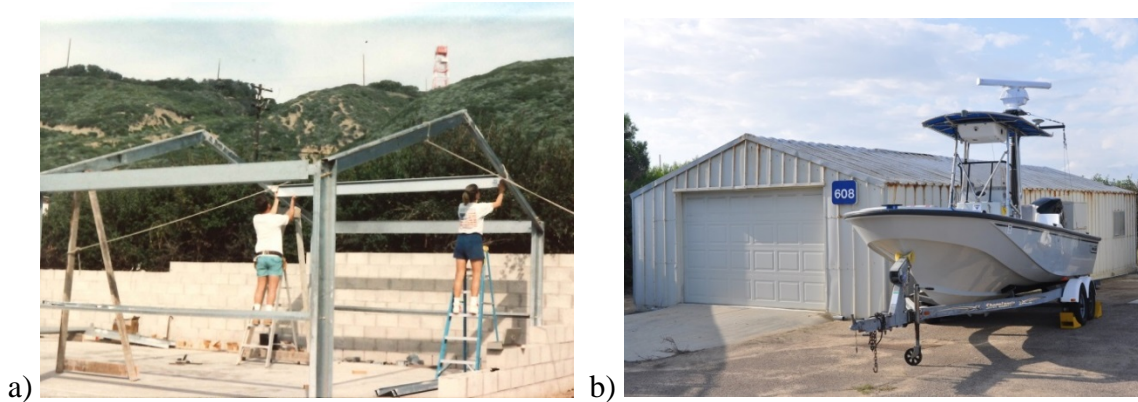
a) Bart Everett and Tracy Heath-Pastore begin assembling the steel framework for Building 618 in 1993. A new parking lot was later constructed on the east side of this structure along Woodward Road. b) Building 608, circa 2015, was similarly erected by Adaptive Systems Branch personnel southeast of Building F-33 (see again Figure 57).
